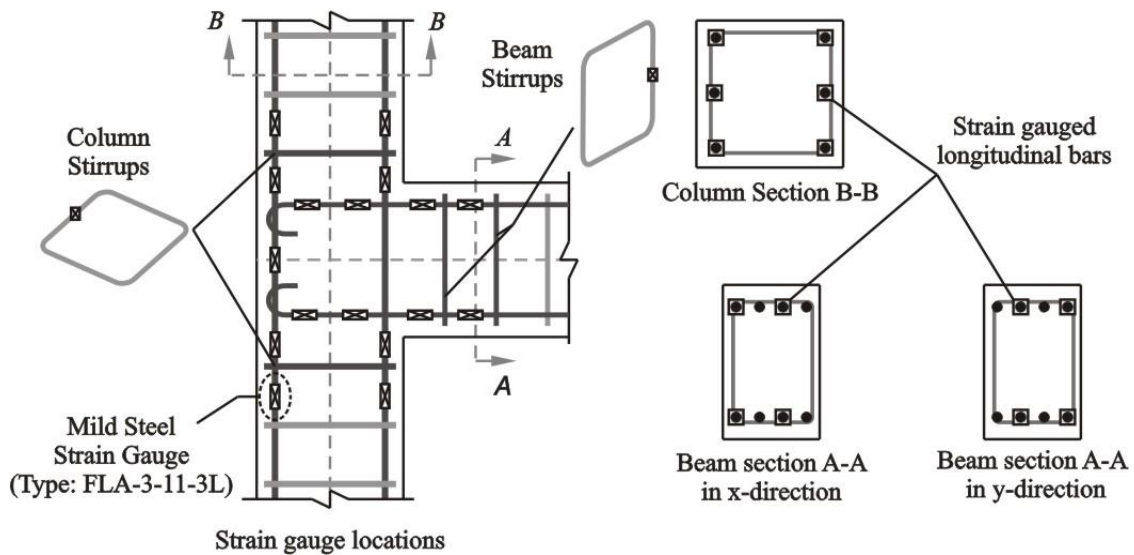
Layout of reinforcement strain gauges in 3D corner joint specimens
